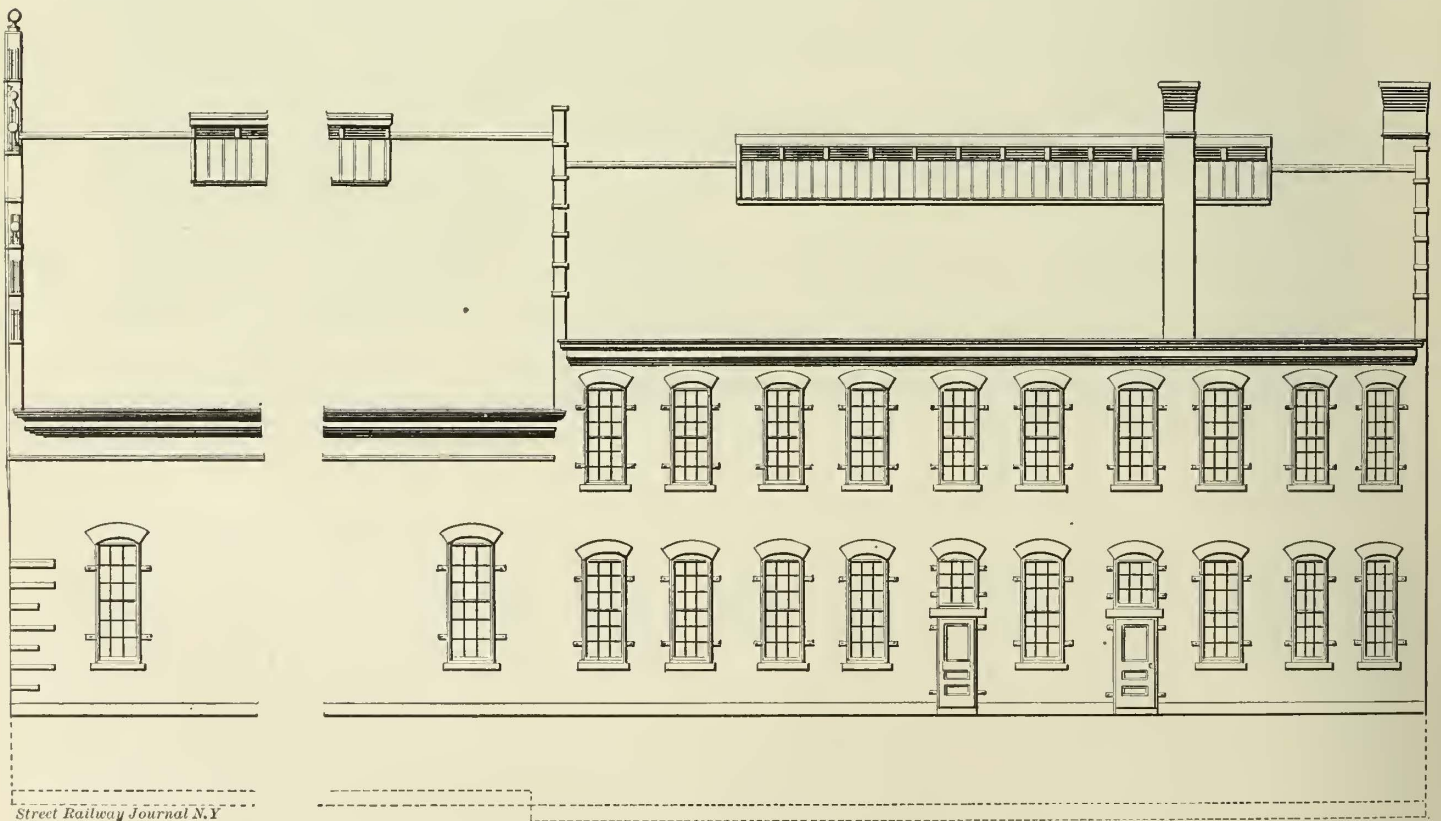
FRONT ELEVATION OF CAR HOUSE—PEOPLE'S STREET RAILWAY.
